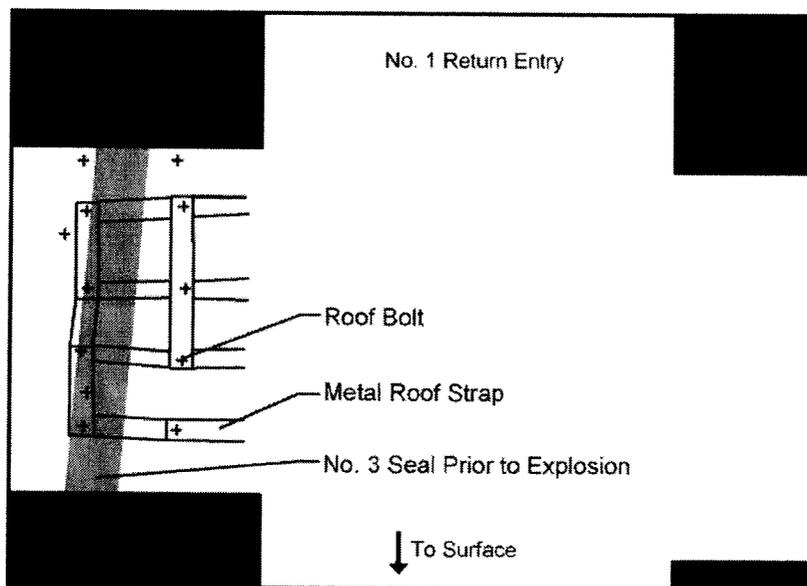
Sketch of Metal Roof Straps at the No. 3 Seal
